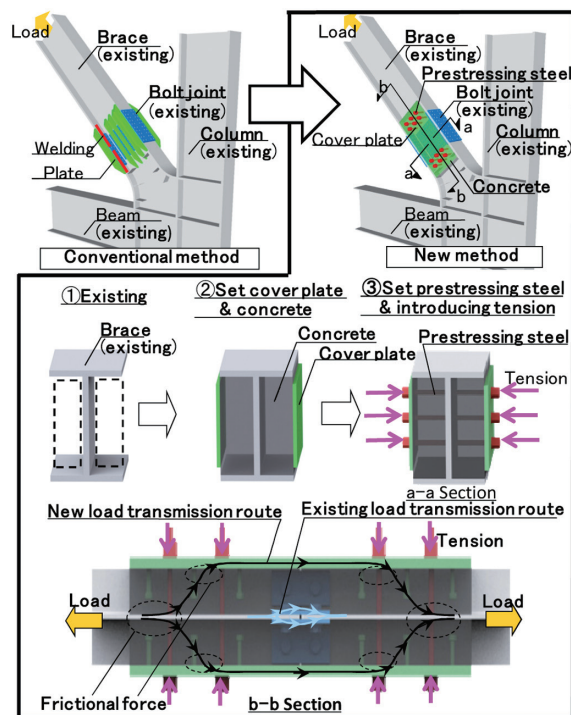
Reinforcement method by welding and by fireless reinforcement method for H-section bracing joint
